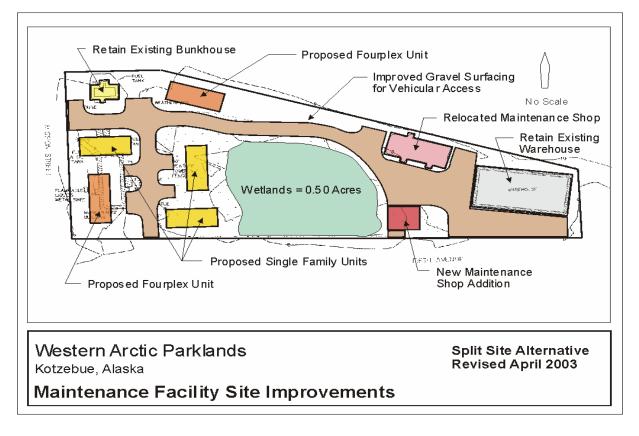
Proposed Improvements to the NPS Fifth Avenue and Mission Street Site
